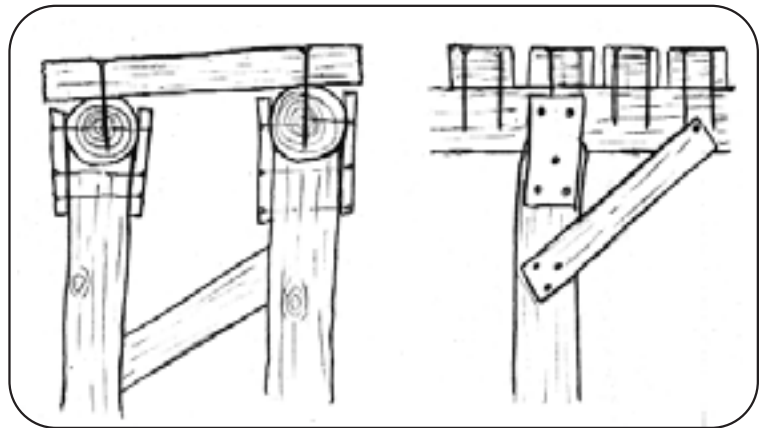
BRIDGE STRINGER SUPPORT AND CROSS BRACING
